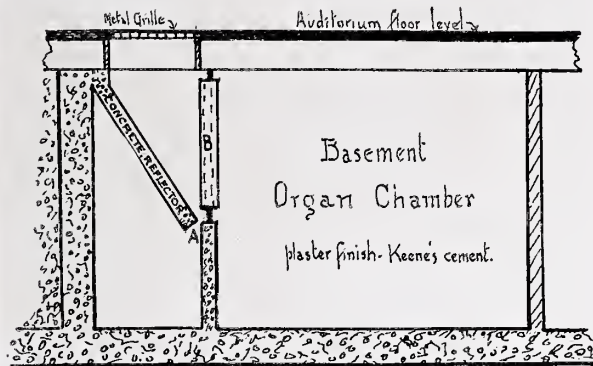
Section of basement floor showing organ chamber and method of deflecting sound to the floor grille
